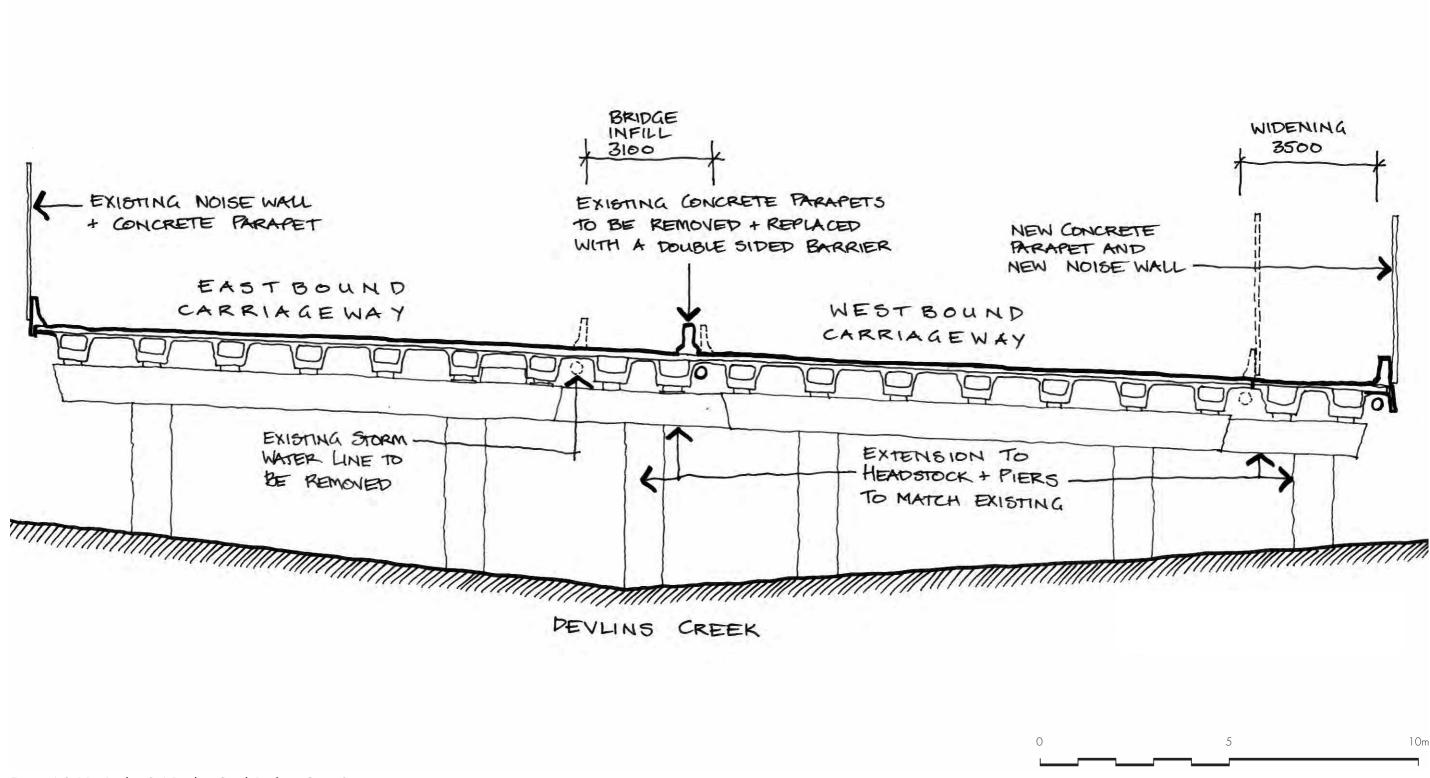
Bridge 2.6 Devlins Creek Bridge - Cross Section
